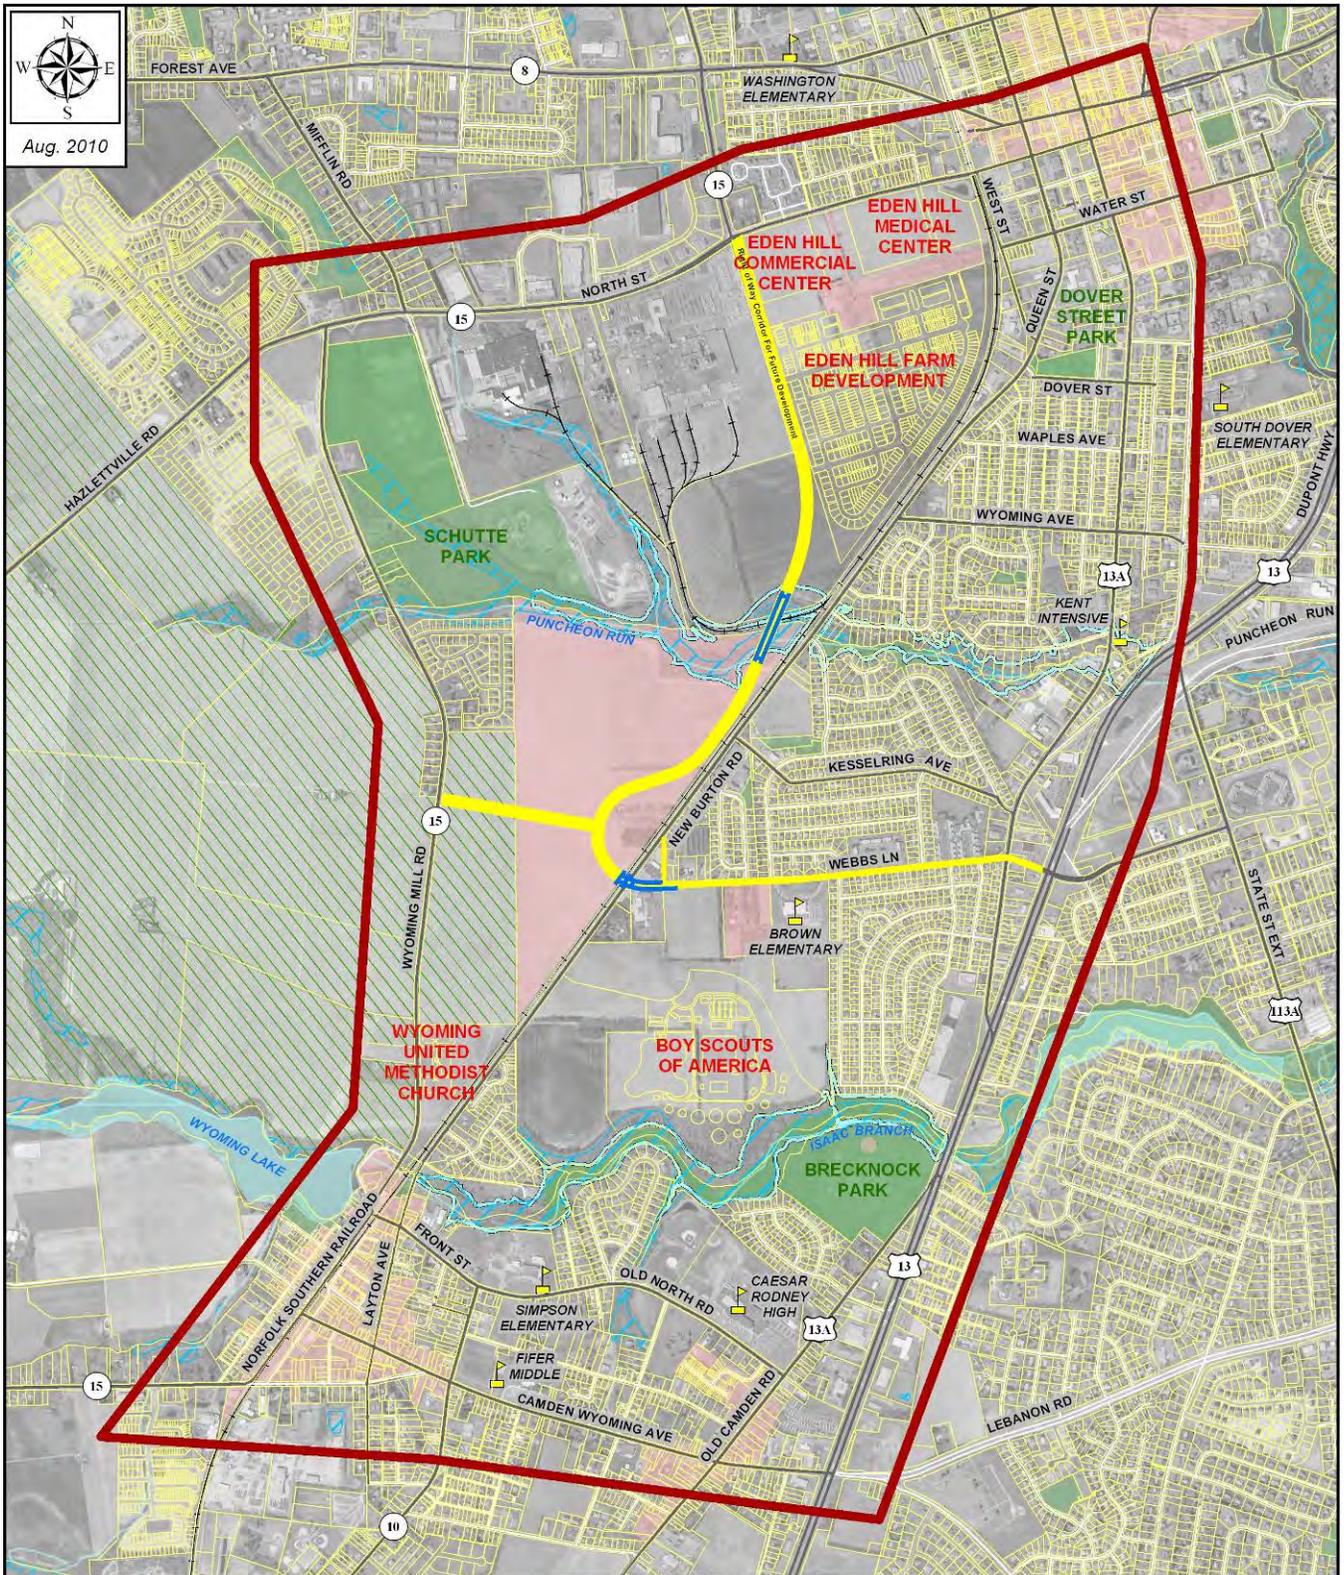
Concept #4: Connection to Webb's Lane to US 13, Auxiliary Connection to Wyoming Mill Road
